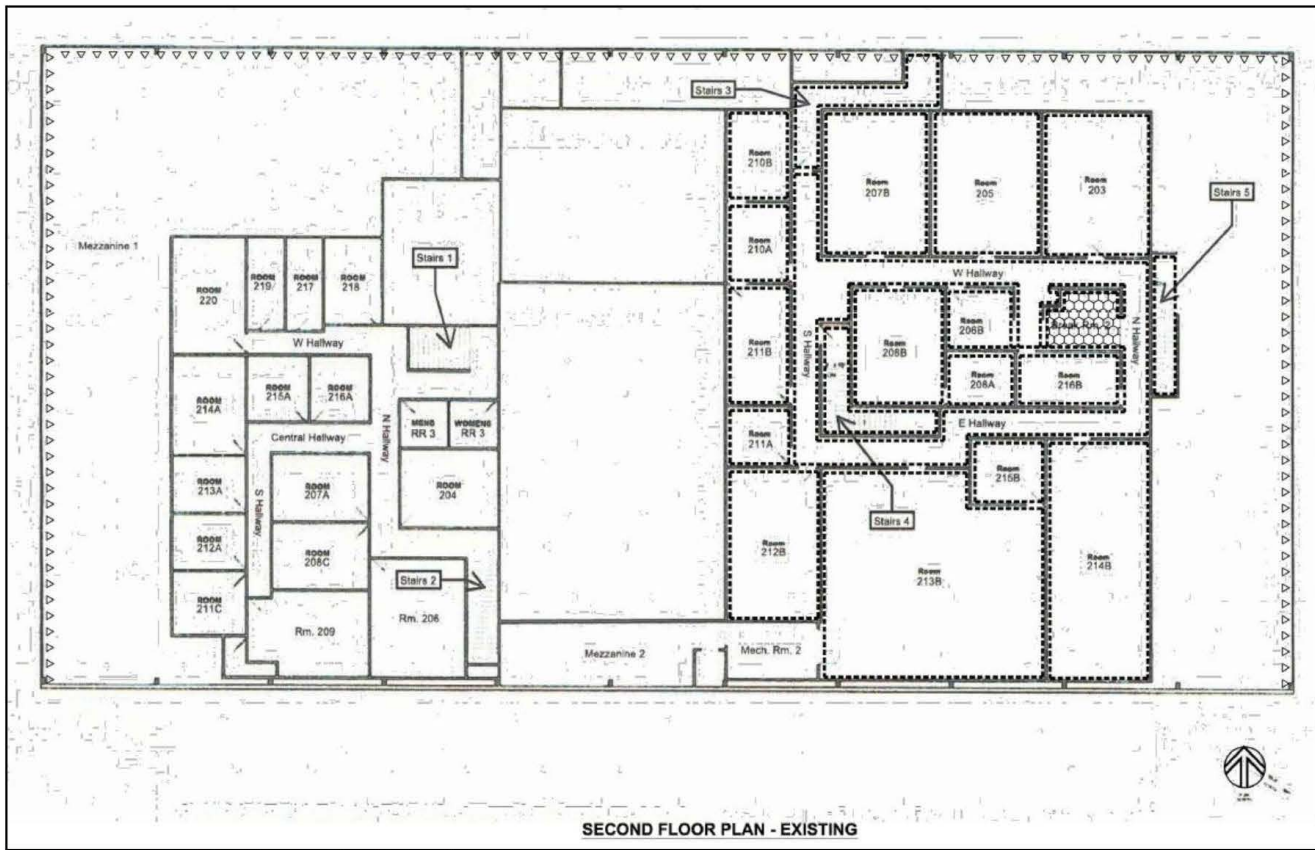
Existing Second Floor Plan. Note: façade at top of image.
